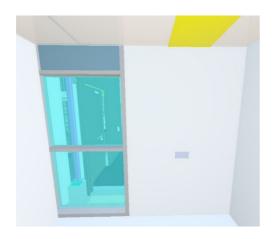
Site/BIM pair of an architectural wall with a narrow vertical glazed opening
